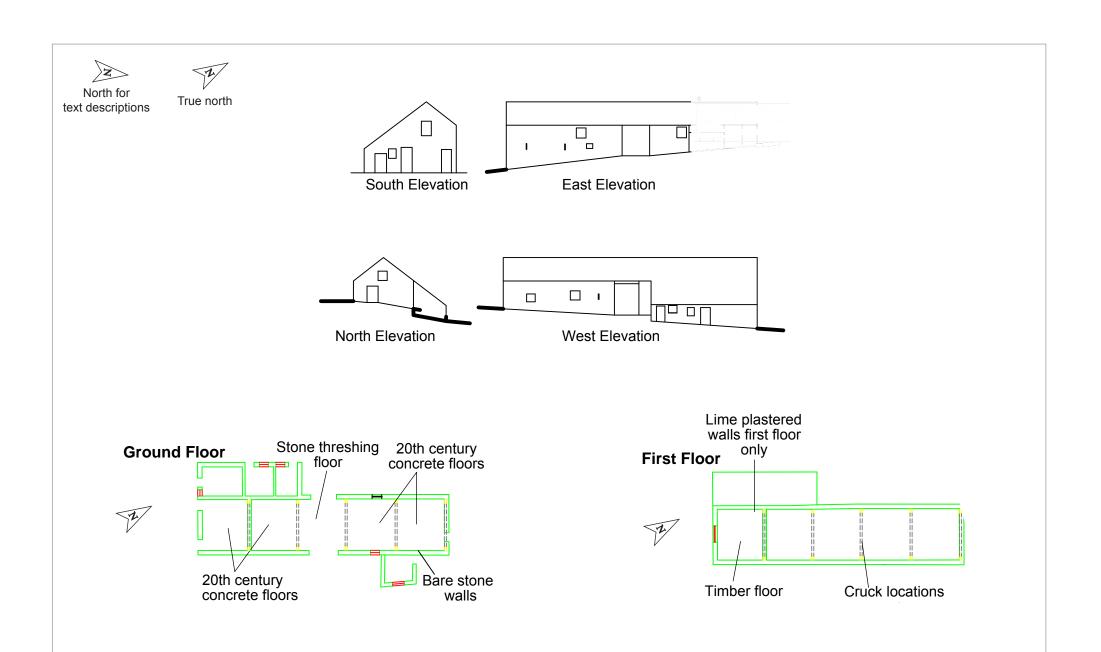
Existing plans and elevations of the cruck barn, 1: 400 (after drawings provided by John Vardy).
